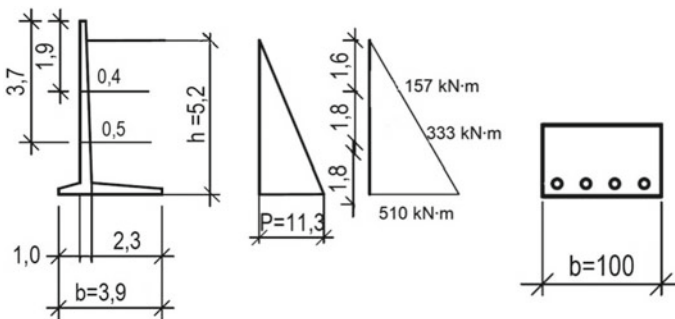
Calculating scheme for the vertical wall of the retaining wall
